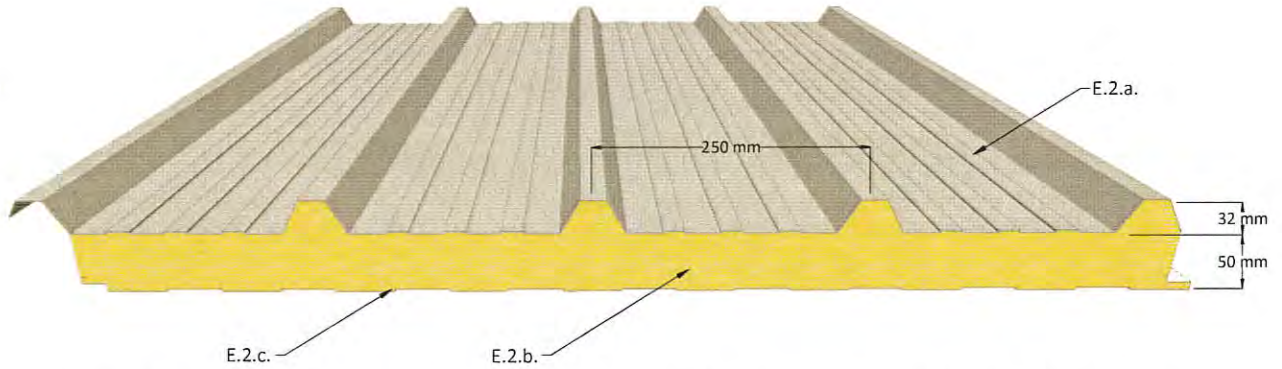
50 mm thick "PIR – Fire Shield Polyisocyanurate Roof/Wall Sandwich Panel" – typical details
